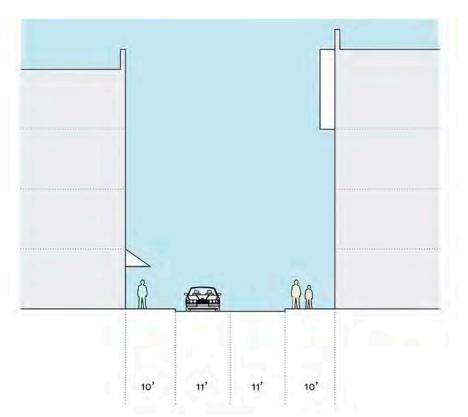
Street dimensions of cross-section of Arelious Walker Drive.
